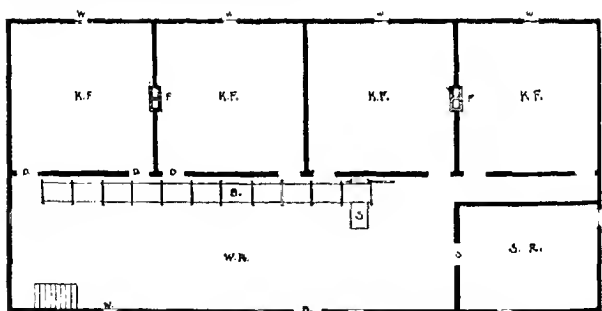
Fig. VII.—Four-kiln Evaporator, Second Story Plan.
